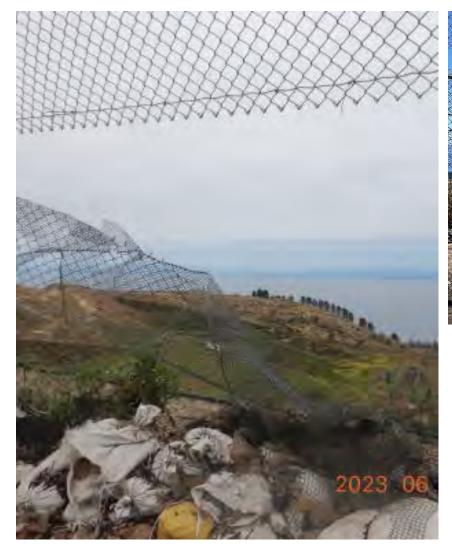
A. June 13, 2023. Damaged working surface, berms, and litter fence.
